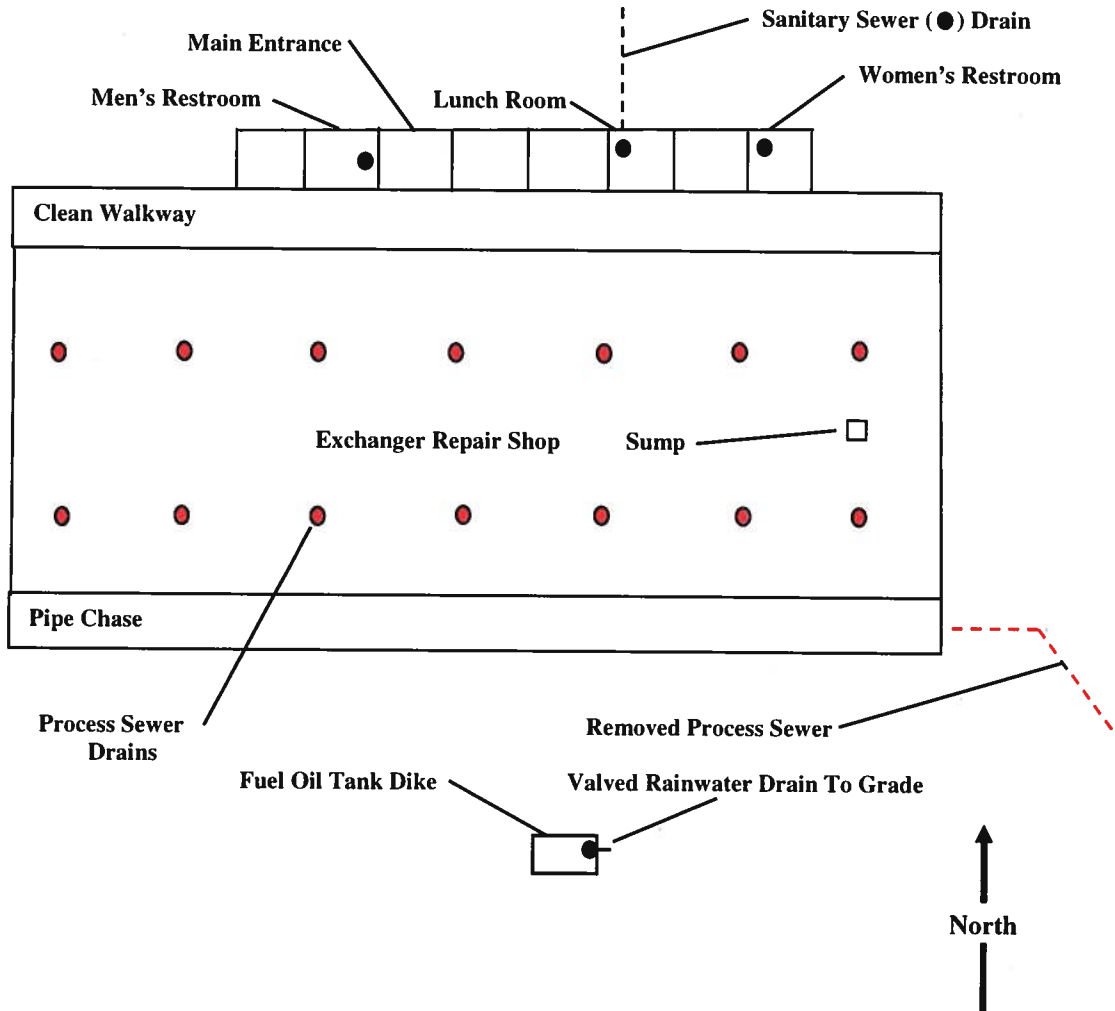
Building 690-N, Process Heat Exchanger Repair Facility (Location)¹
